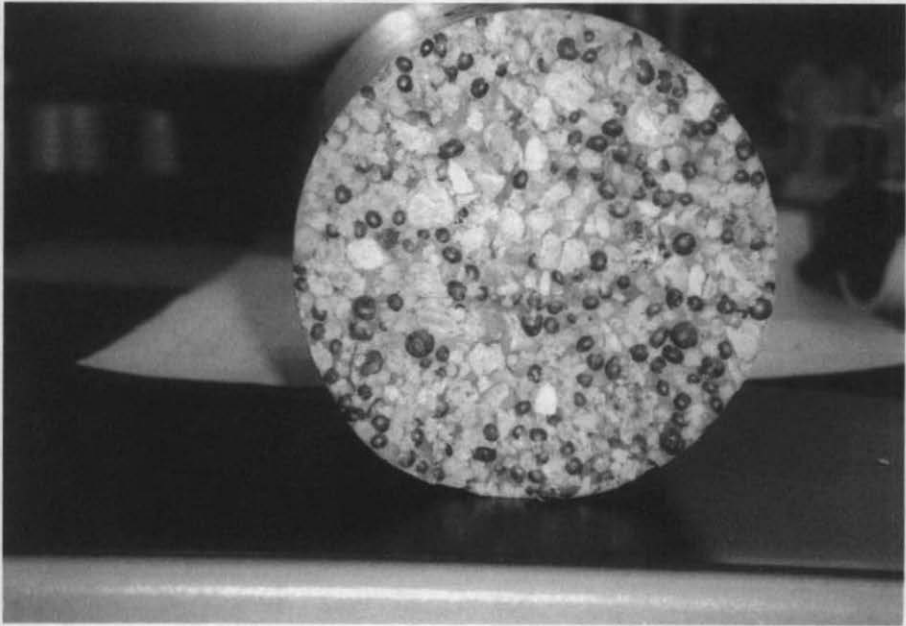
Specimen of heavy concrete for CONSTOR casks
